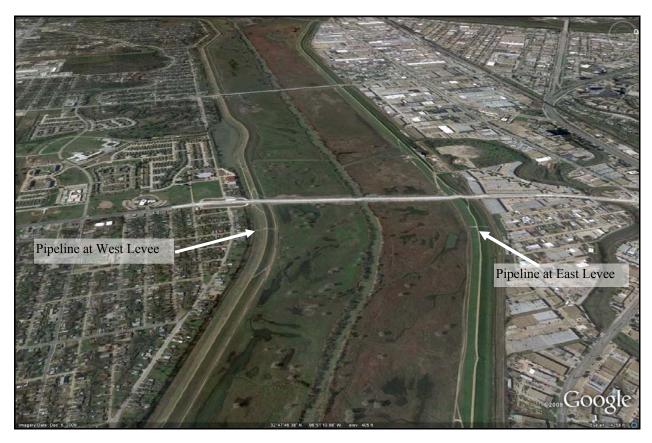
Aerial View Looking West Showing Scale of Pipelines Relative to Dallas Floodway
